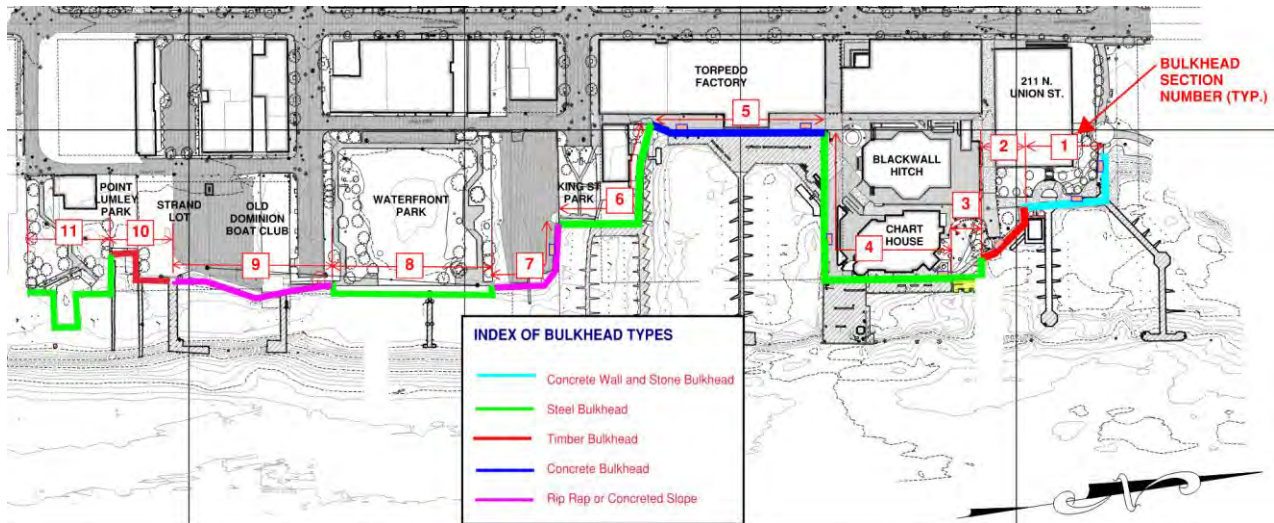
Existing Bulkhead Sections Identified in January 2022 Site Walk.
